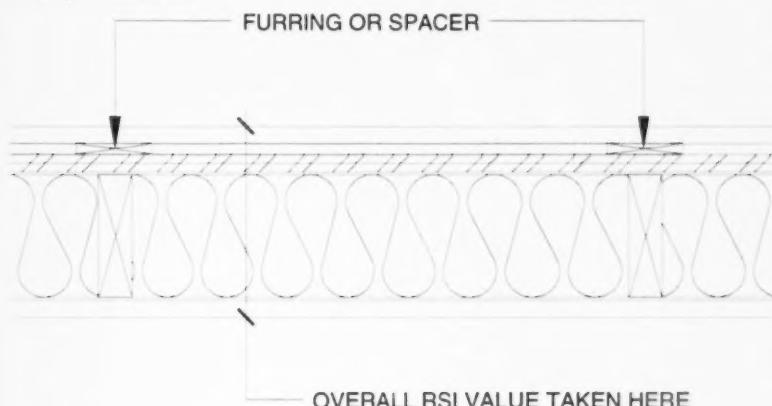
1 Furring or Spacers not Considered for RSI of Assembly
